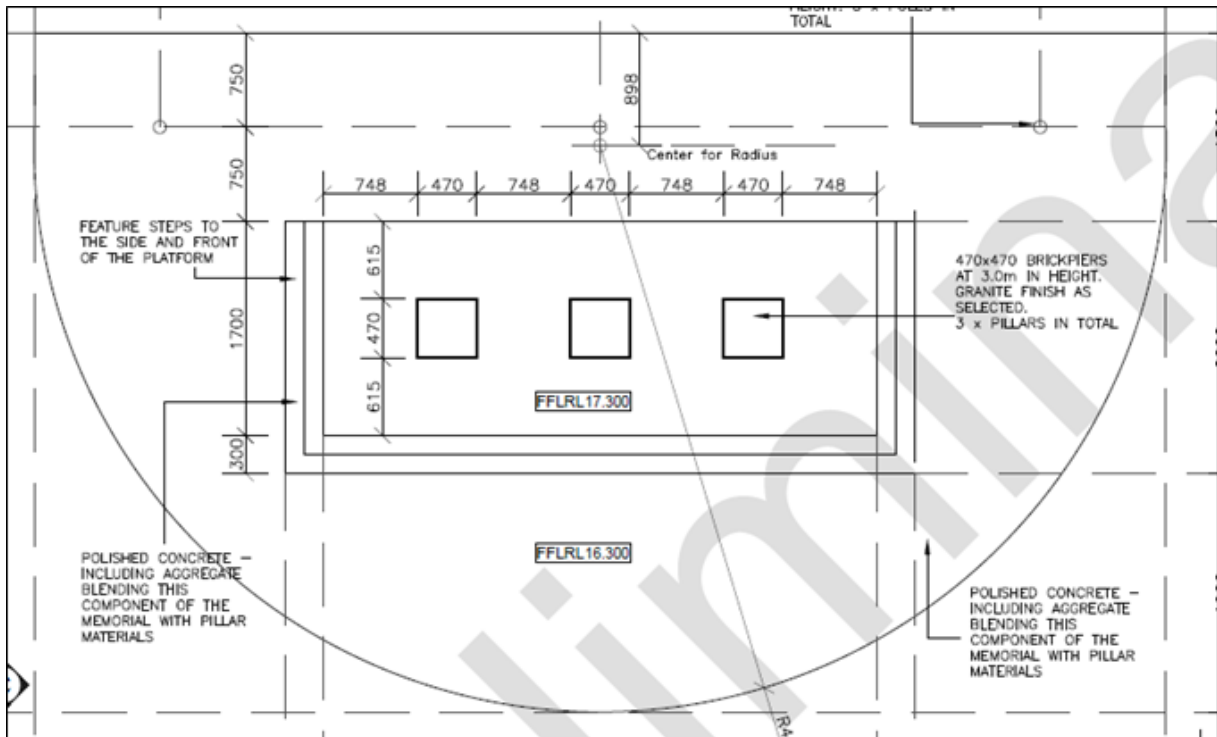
Proposed Floor Plan showing layout of proposal submitted with DA0350/23
